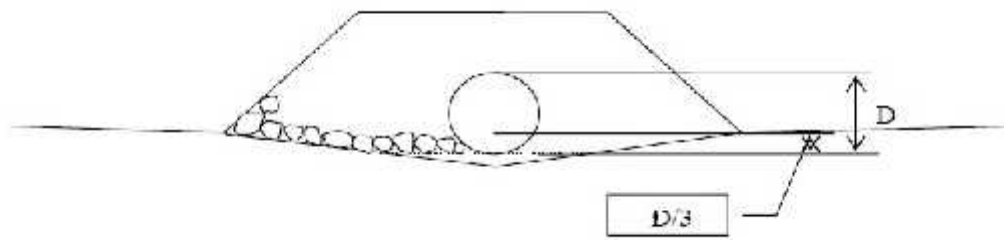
Good example of leachate collection facilities and good example of main leachate collection pipe
